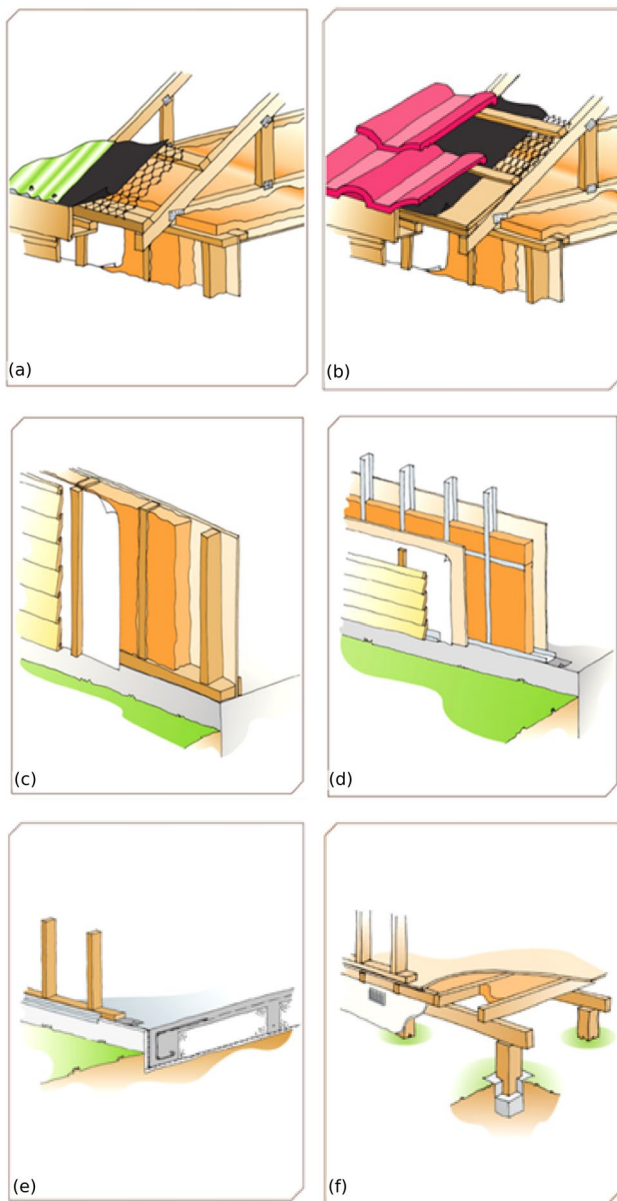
(a) Roof assembly with steel cladding; (b) roof assembly with concrete tiles; (c) wall assembly with timber frame; (d) wall assembly with steel frame; (e) floor assembly using a concrete floor slab; (f) floor assembly using suspended timber floor. Colour key: brown=timber framing, yellow=timber weatherboard cladding, orange=insulation, black=roof underlay and mesh, green=steel cladding, red=concrete tiles, white=building wrap, grey=concrete. [Images sourced from BRANZ (2023e)]
